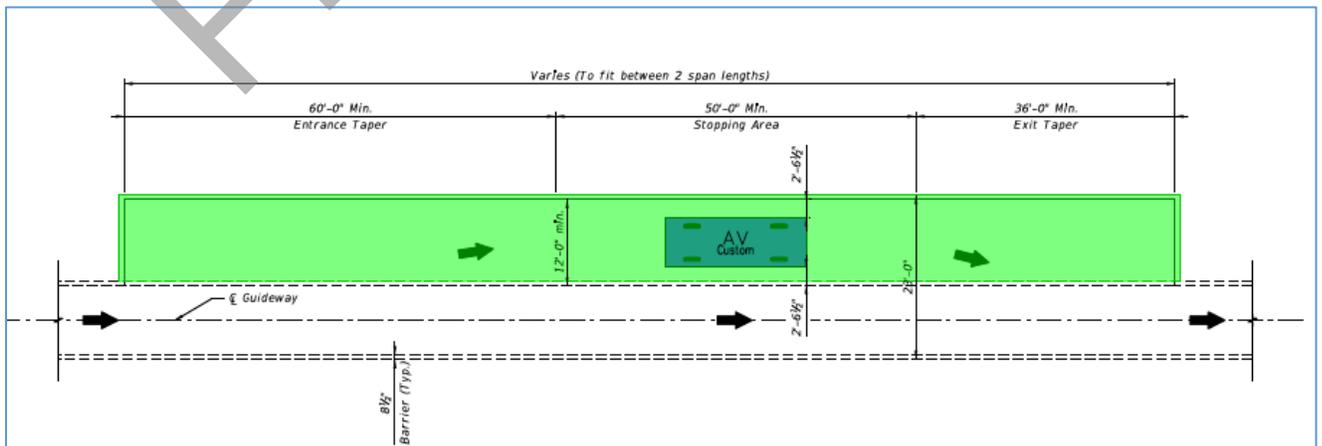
CHARGING AREA AT TYPICAL SECTION
